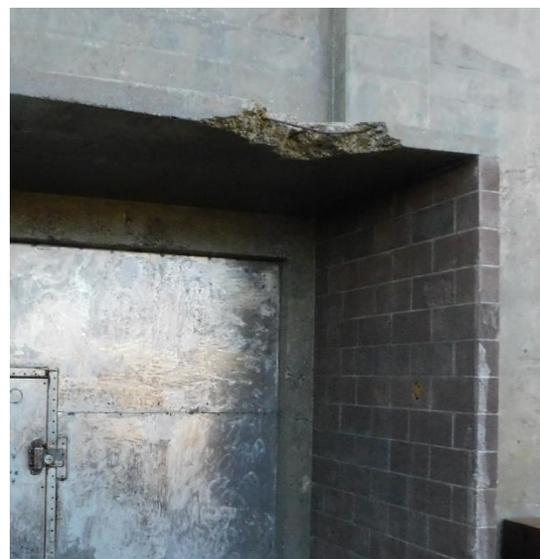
Spalling of concrete slab at top of roof of wind screen.
